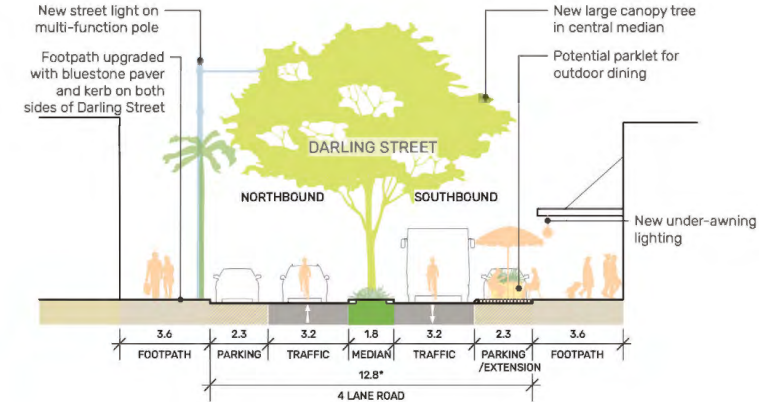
Darling Street Section (1:200) - Proposed Gateway Configuration
